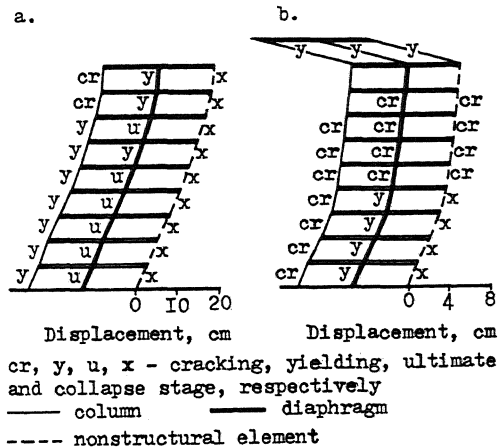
Deformation state of the "S" type building under the Gukasian accelerogram action a - without flexible top storey; b - with flexible top storey (vibration damper)
